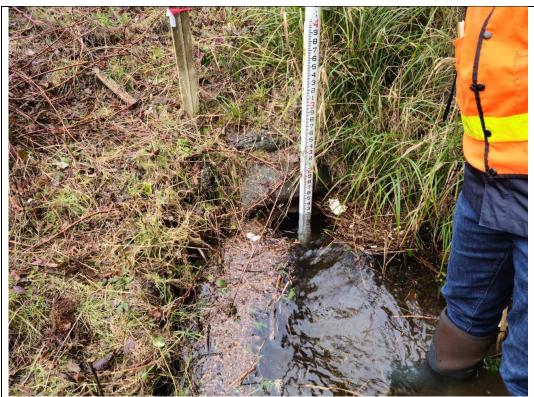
Outlet of culvert 995232, Sediment deposition at outlet has embedded culvert clearance to approximately 1' at outlet. January 2021.
